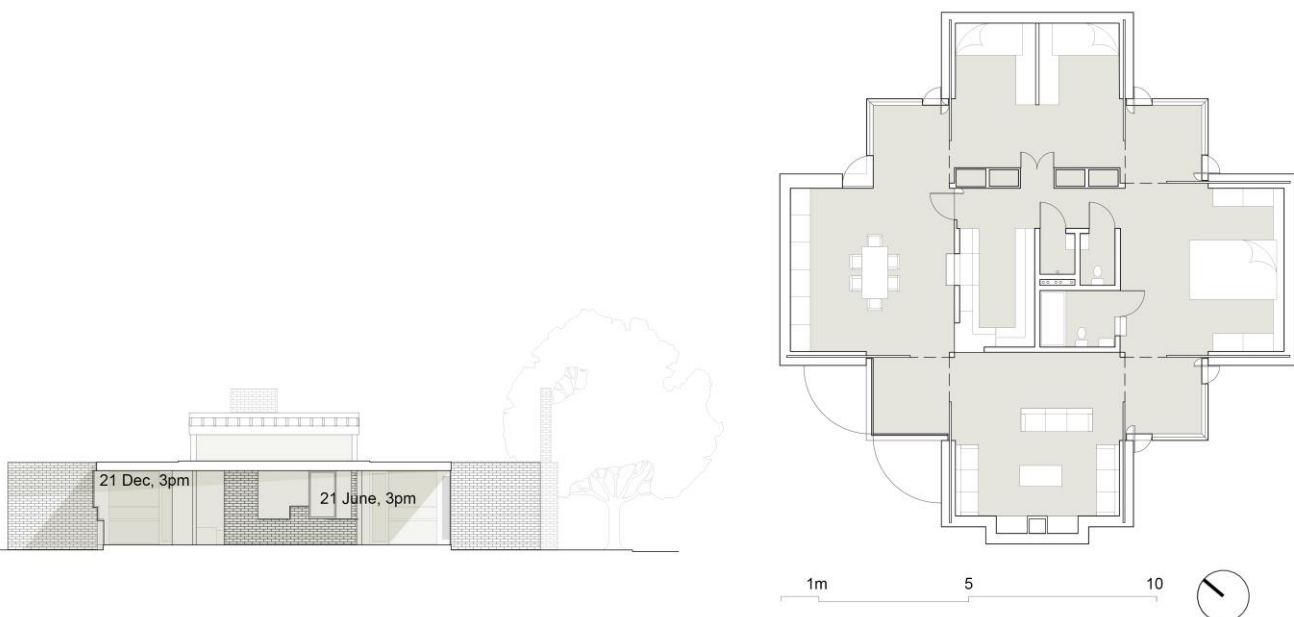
Villa Norrköping, Sverre Fehn, 1964. Plan and section.
